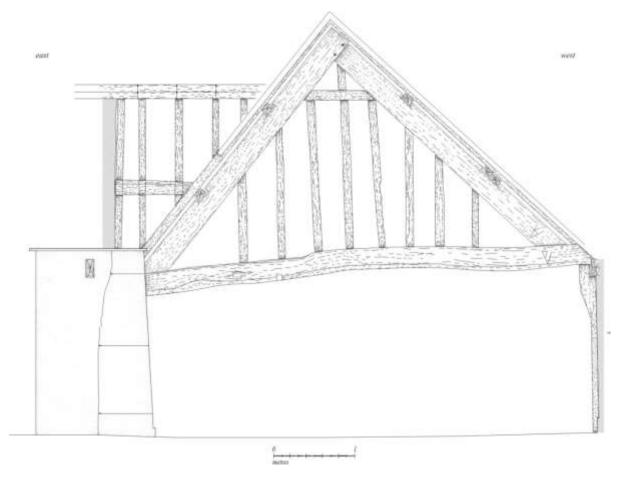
Principal range roof structure – northern surviving truss (truss V),upper (north) side, showing rear range roof running in
